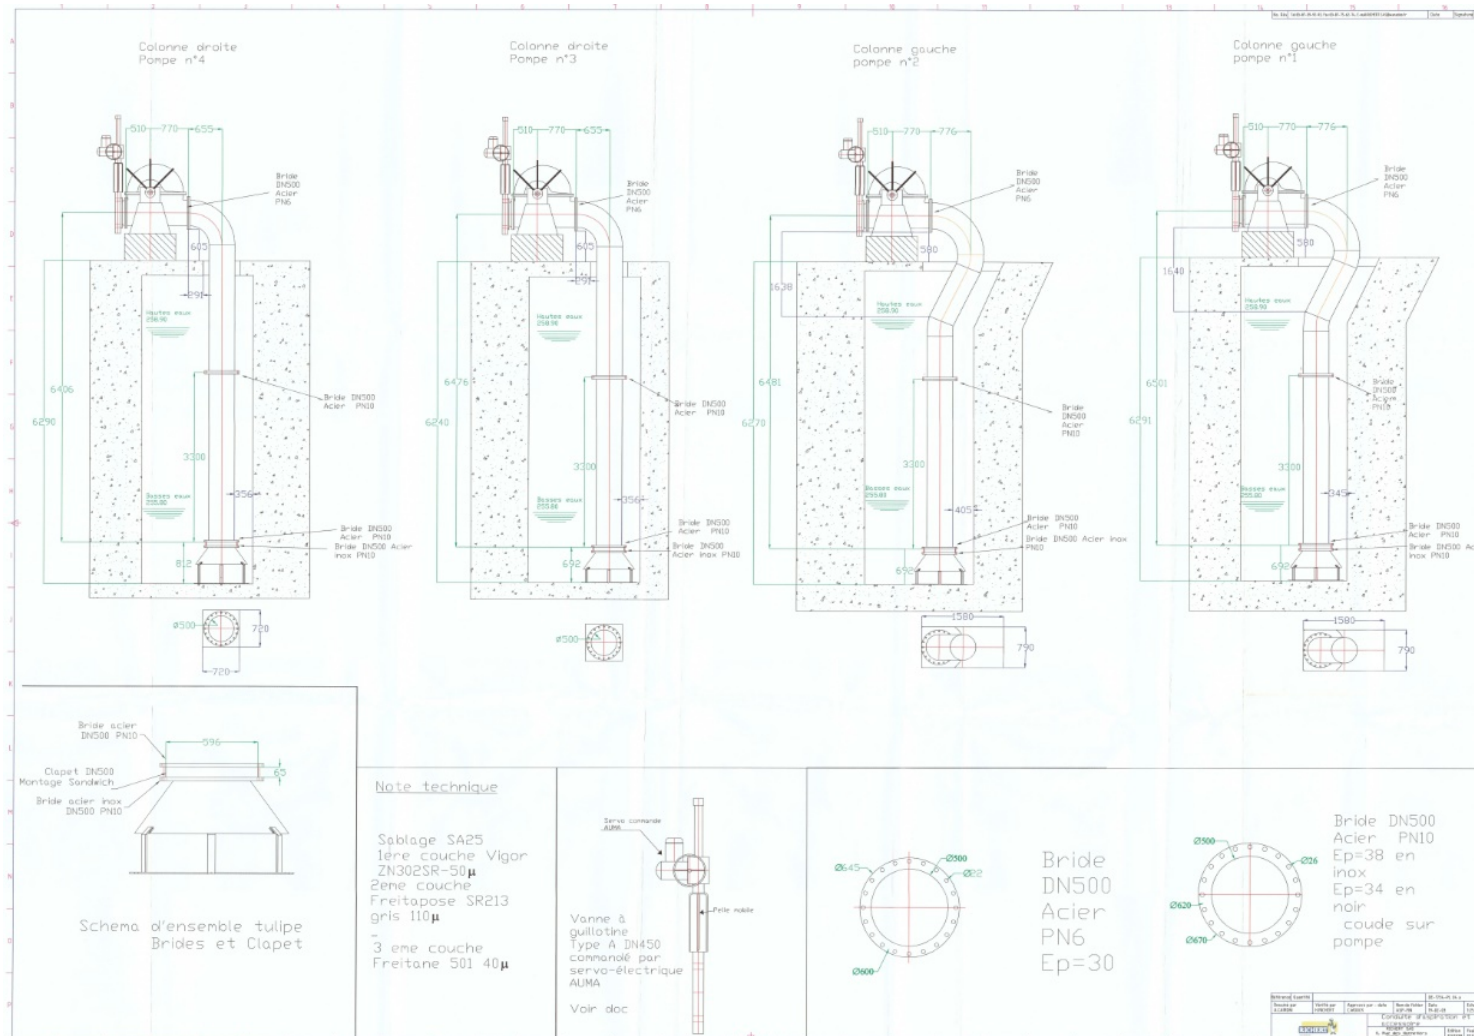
Existing Pump Arrangement (Sections) at Stock PS
